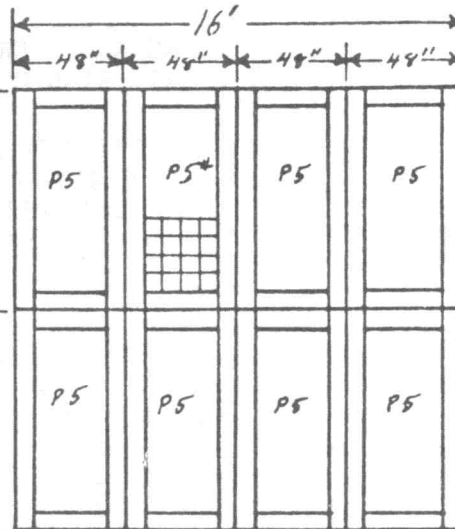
Top view of top or roof panels and location of bird entrance.
